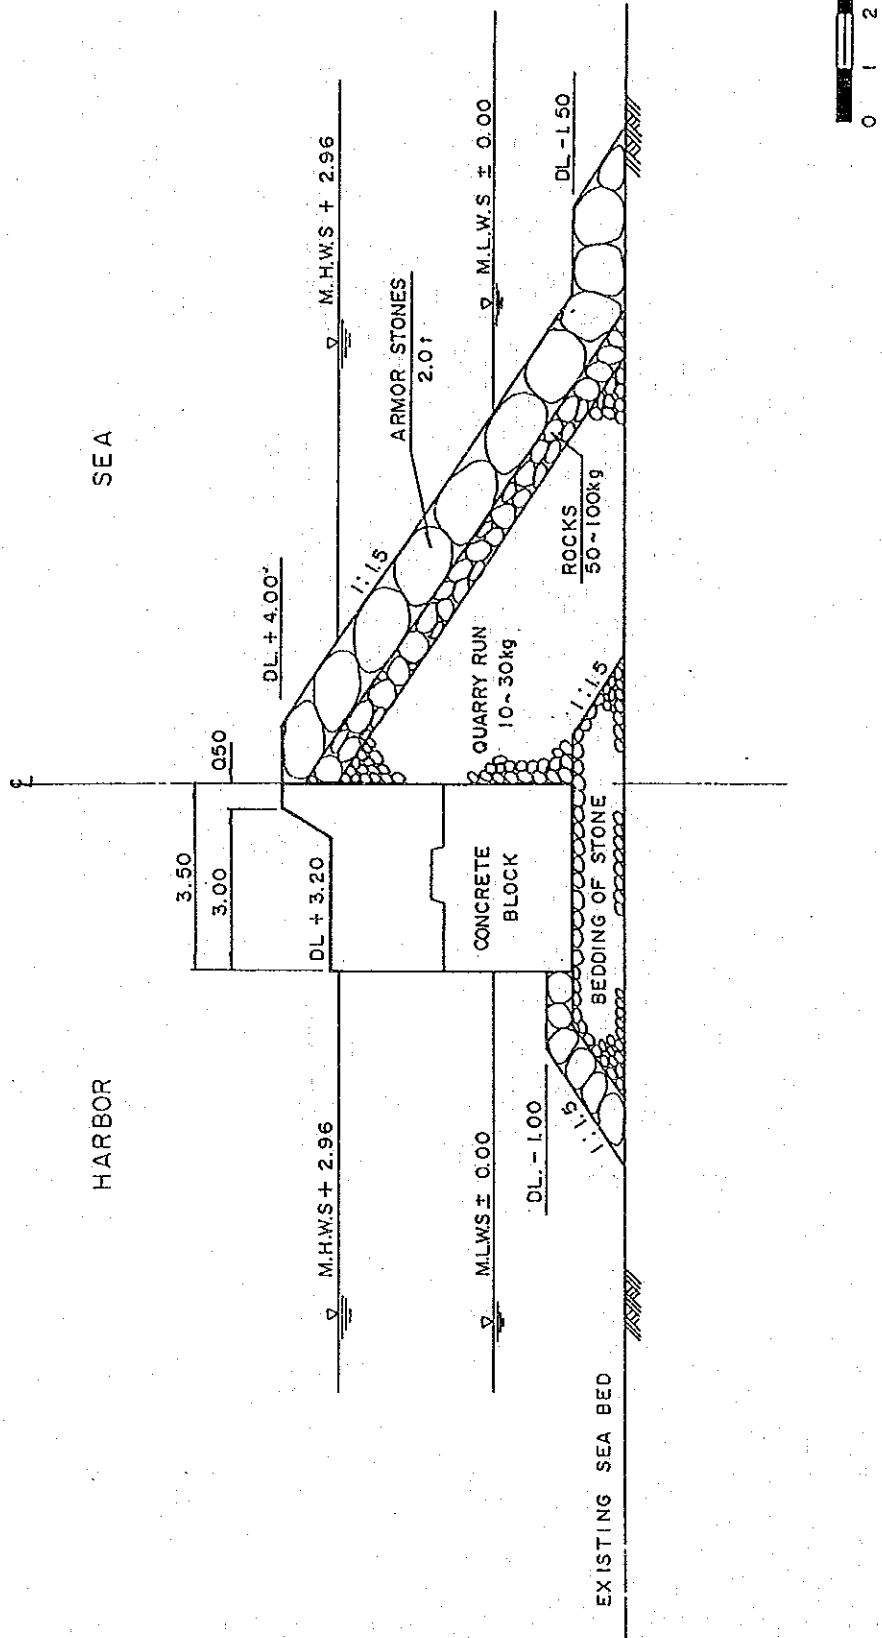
Typical Cross Section of Breakwater(1)
